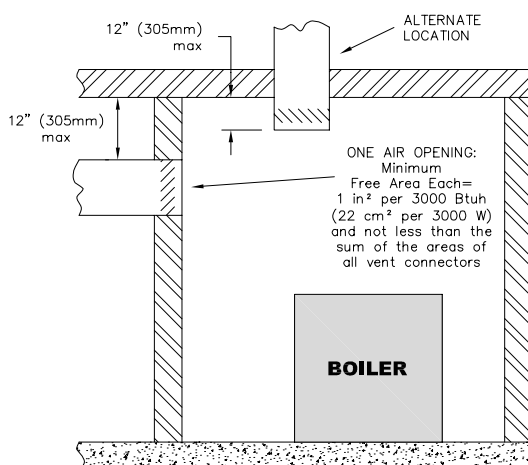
Air Openings – All Air from Outdoors through One Opening
